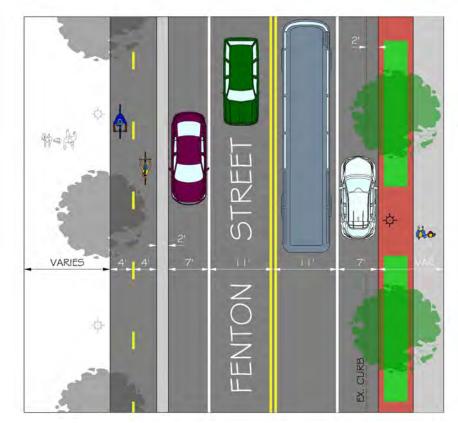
Proposed Typical Section 2, Fenton Street from Gist Avenue to Wayne Avenue
